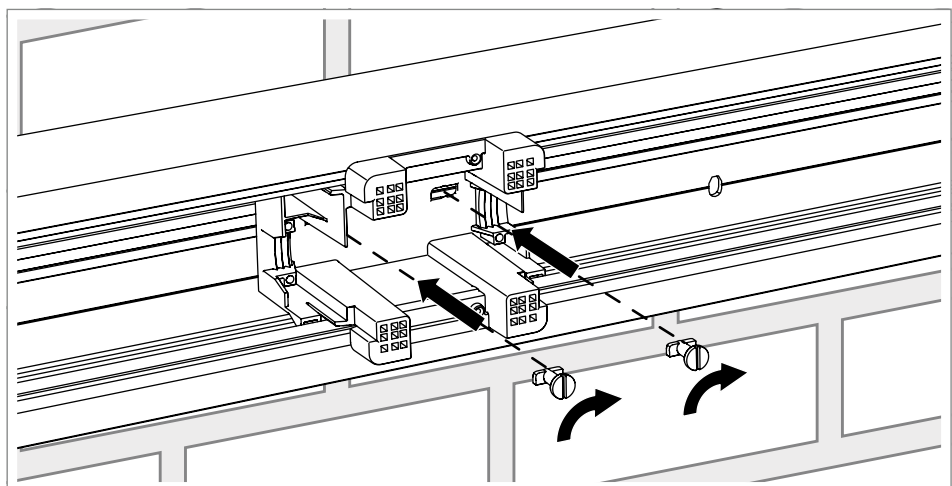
Screwing in the accessory mounting box 71GDCEE
